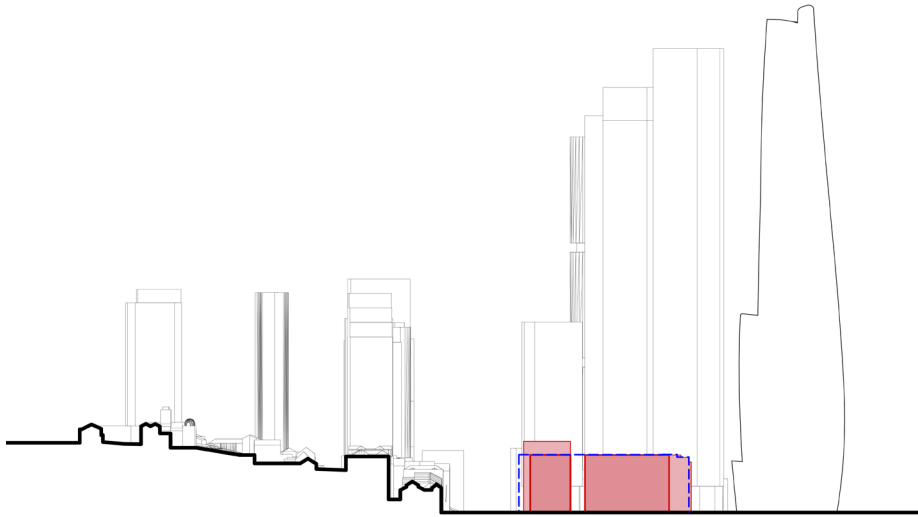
Figure F Sectional Elevation Looking South - MOD 9 - RtS (Source: Modified from SJB diagrams October 2023)
